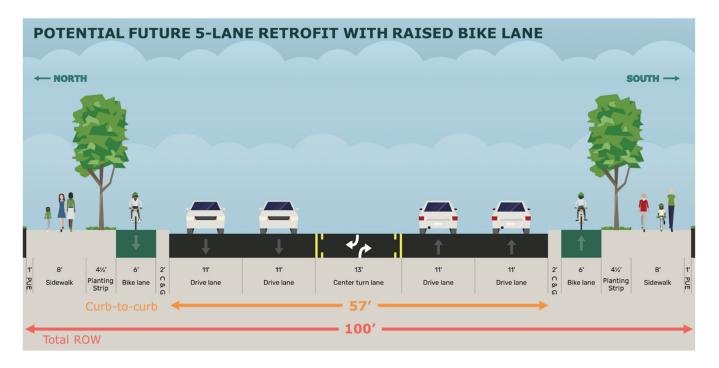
FARMINGTON ROAD CORRIDOR - FUTURE 5-LANE CROSS-SECTION RETROFIT WITH RAISED BIKE LANE (BLTS= 1, PLTS= 2)
